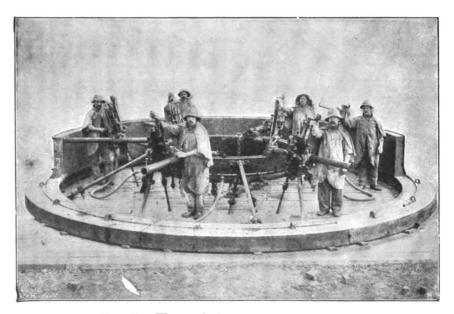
WALKER'S PATENT SINKING FRAME.
